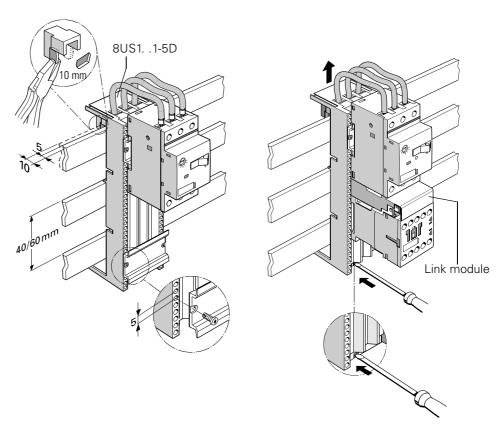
Mounting circuit breakers/MSPs on busbar adapters (frame sizes S00 and S0)
